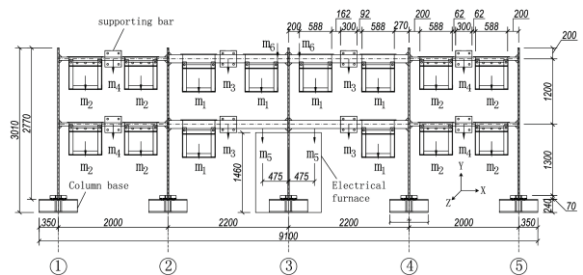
Loading arrangement of test frame (All dimensions are in millimetres) [9]
